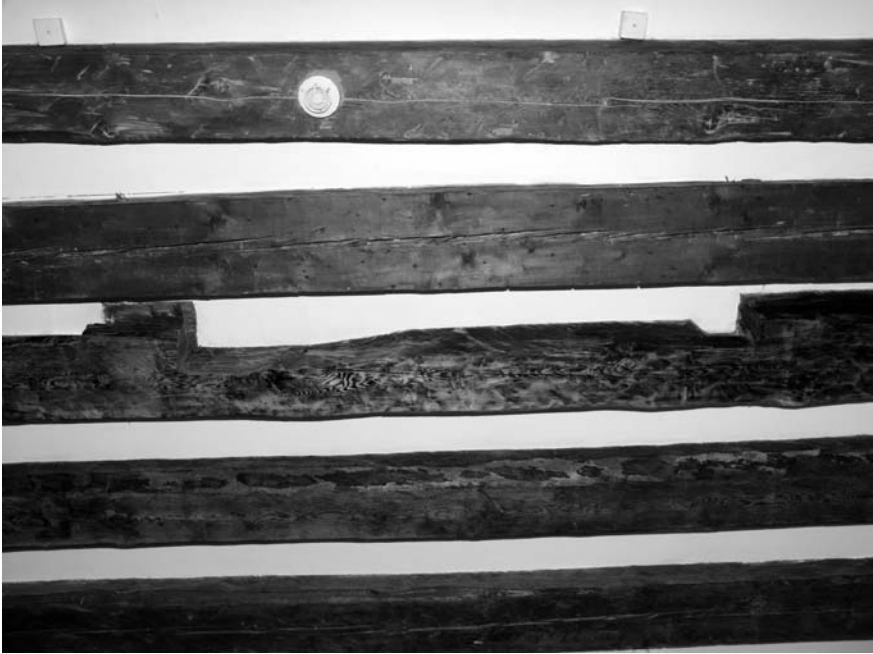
Reused beams on the first storey. Photo by Heidi Tooming.
